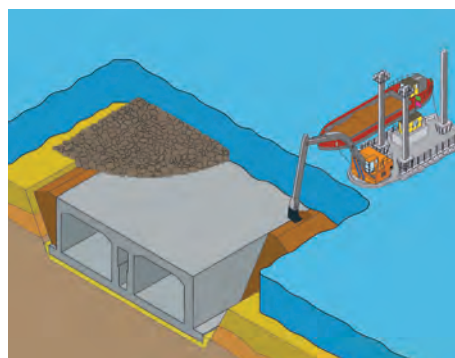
Backfill material is placed beside and over the tunnel to fill the trench and permanently bury the tunnel, as illustrated above.
